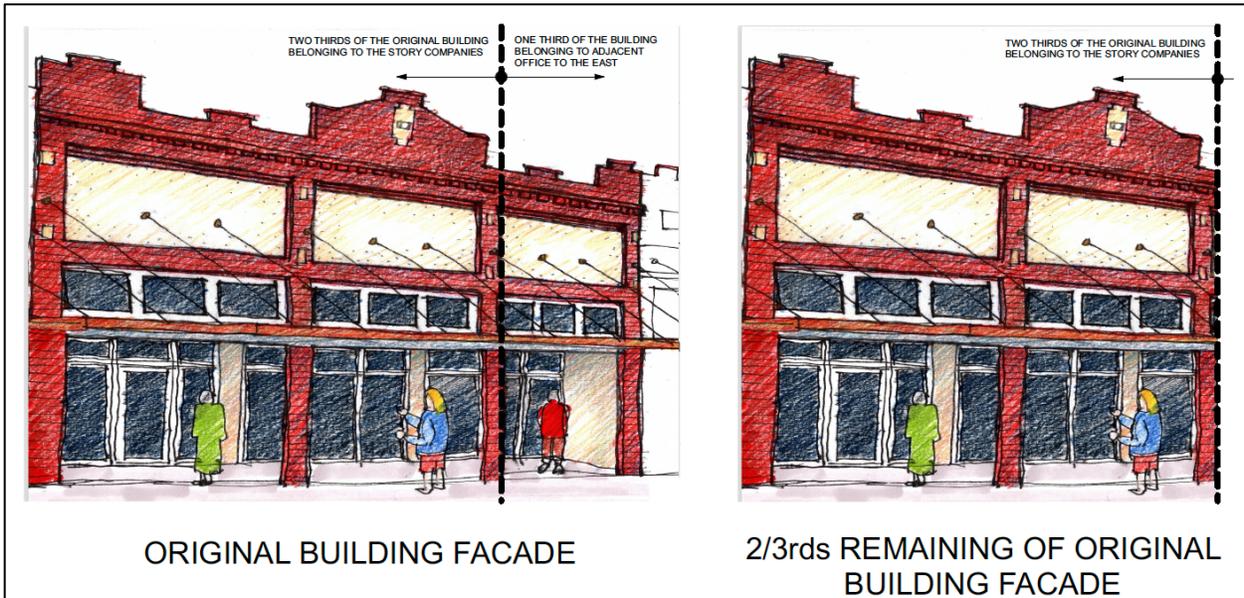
Concept sketch of the proposed façade at 211-215 E Park Avenue.
